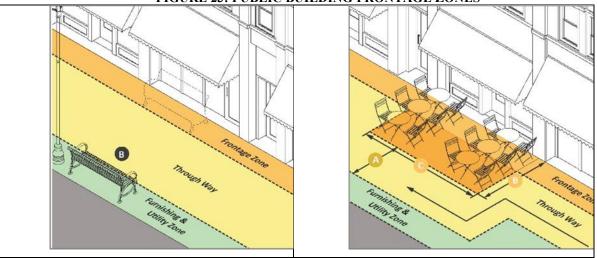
PUBLIC BUILDING FRONTAGE ZONES
